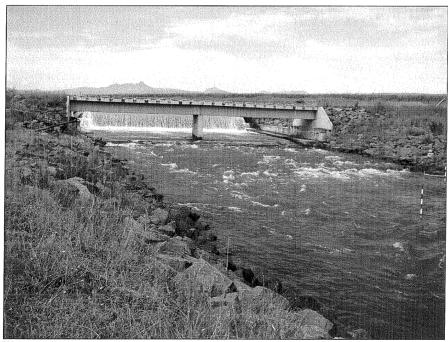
Dam wall and bridge at the hydro-electric power plant site at Middle Kruisvallei 190.
